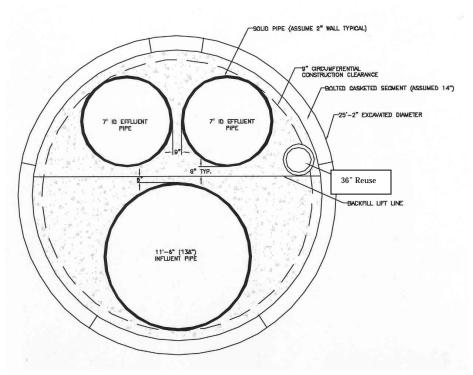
Typical Combined Tunnel Cross Section (Alternative 1)
